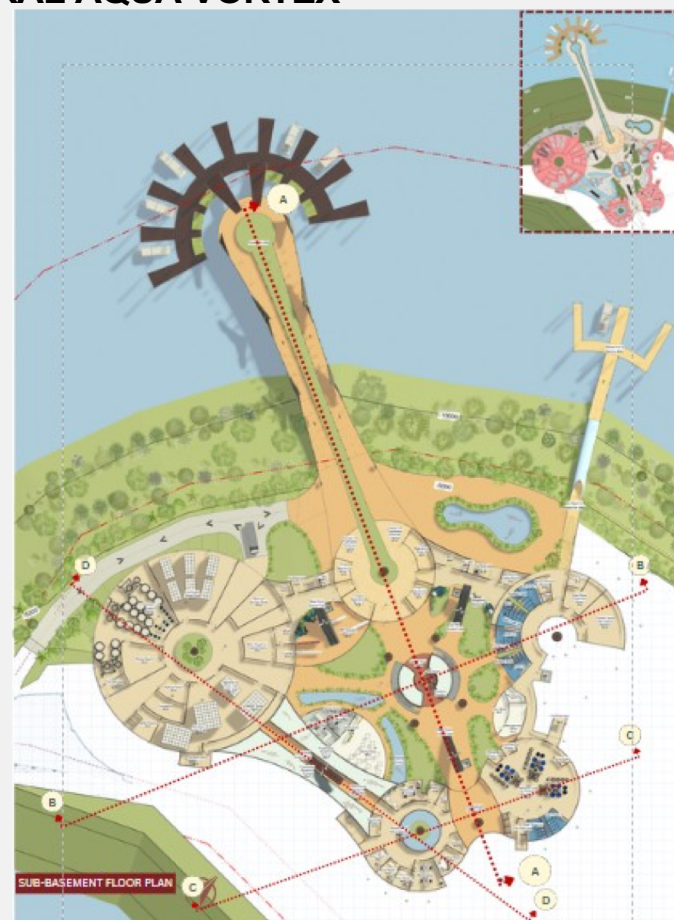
Sub-basement Plan showing Central Aqua Vortex as meeting point of both building entrances
